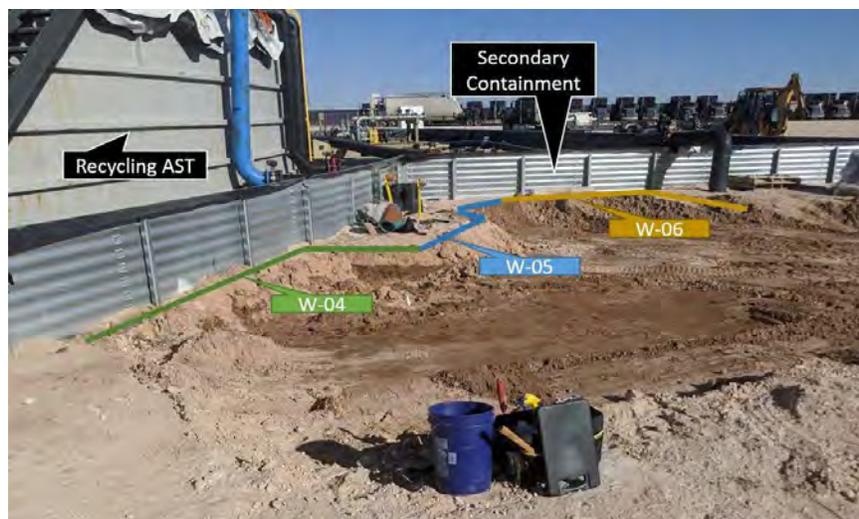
Photo of wall deferral locations along recycling and secondary containments.
